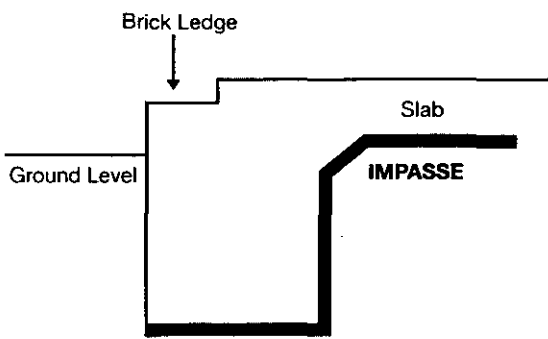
Shows position of Impasse Barrier installed beneath the external beam and slab panel of a supported slab on ground.
